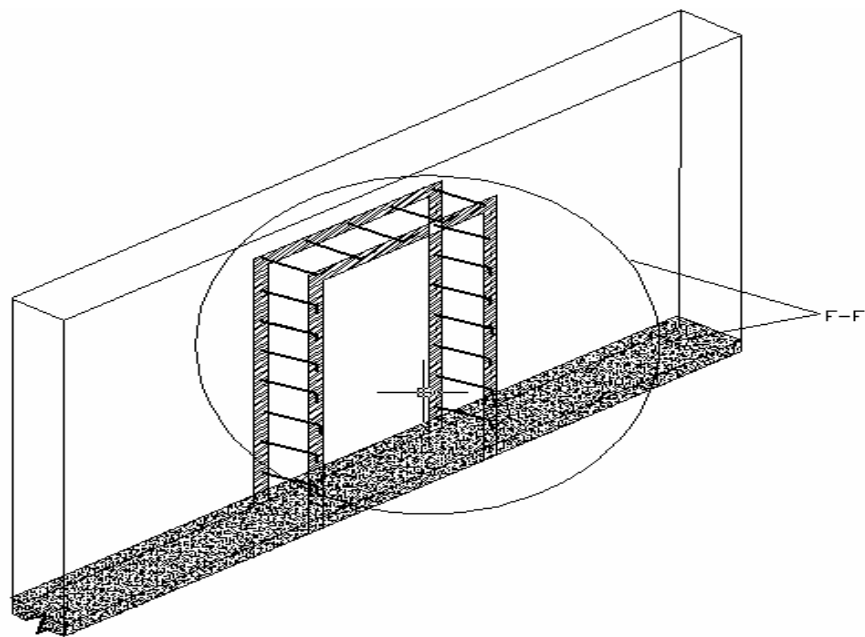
Arrangement of Flats at window openings:-
